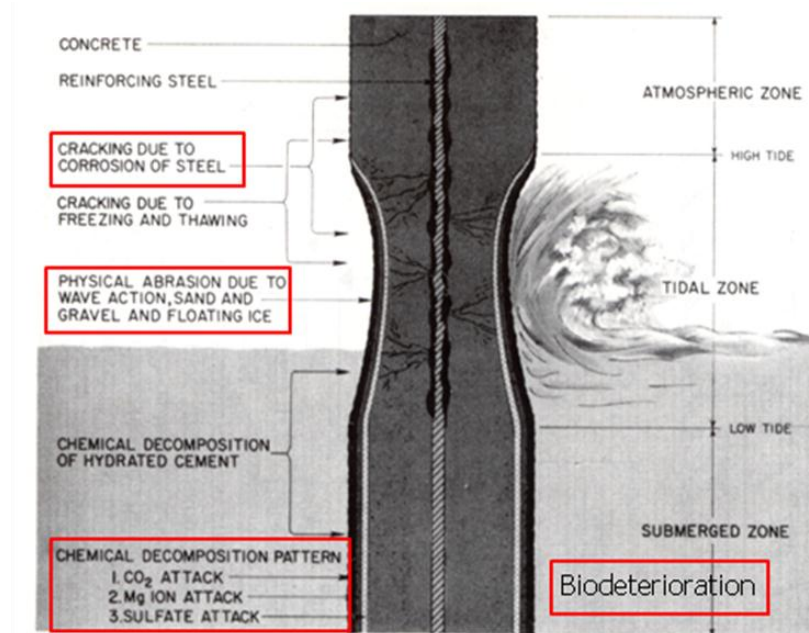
Typical degradation mechanisms in coastal concrete piling (Mehta, 1991)
